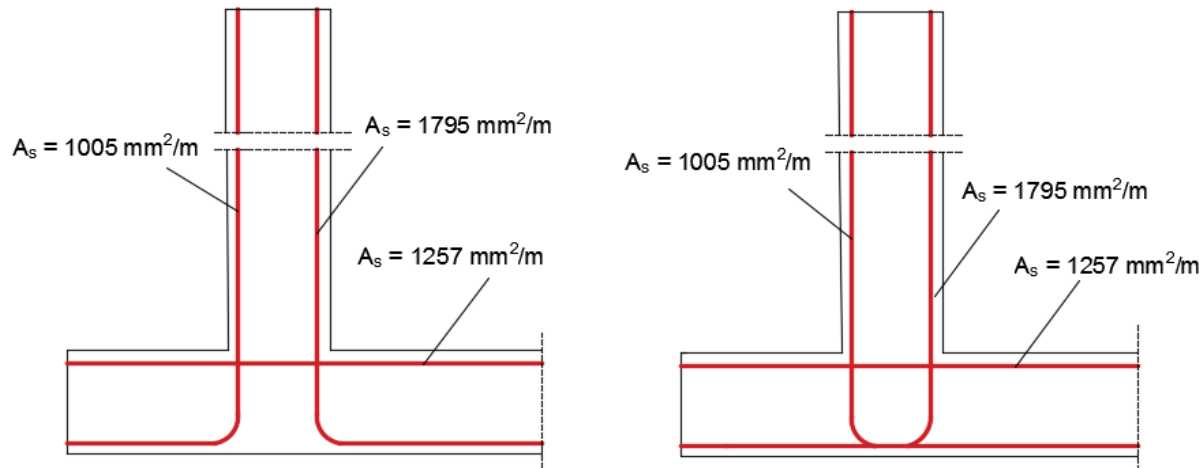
Typical structural details of the retaining wall to be studied. They would be subsequently referred to as (a). Reinforcement Layout 1, and (b). Reinforcement Layout 2 respectively.
